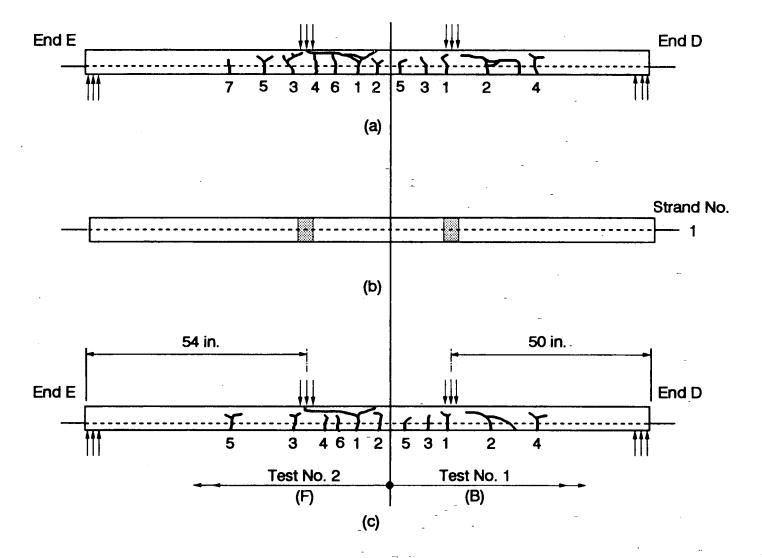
Crack patterns for D-type Specimen No. 10-6.0DU-9:
